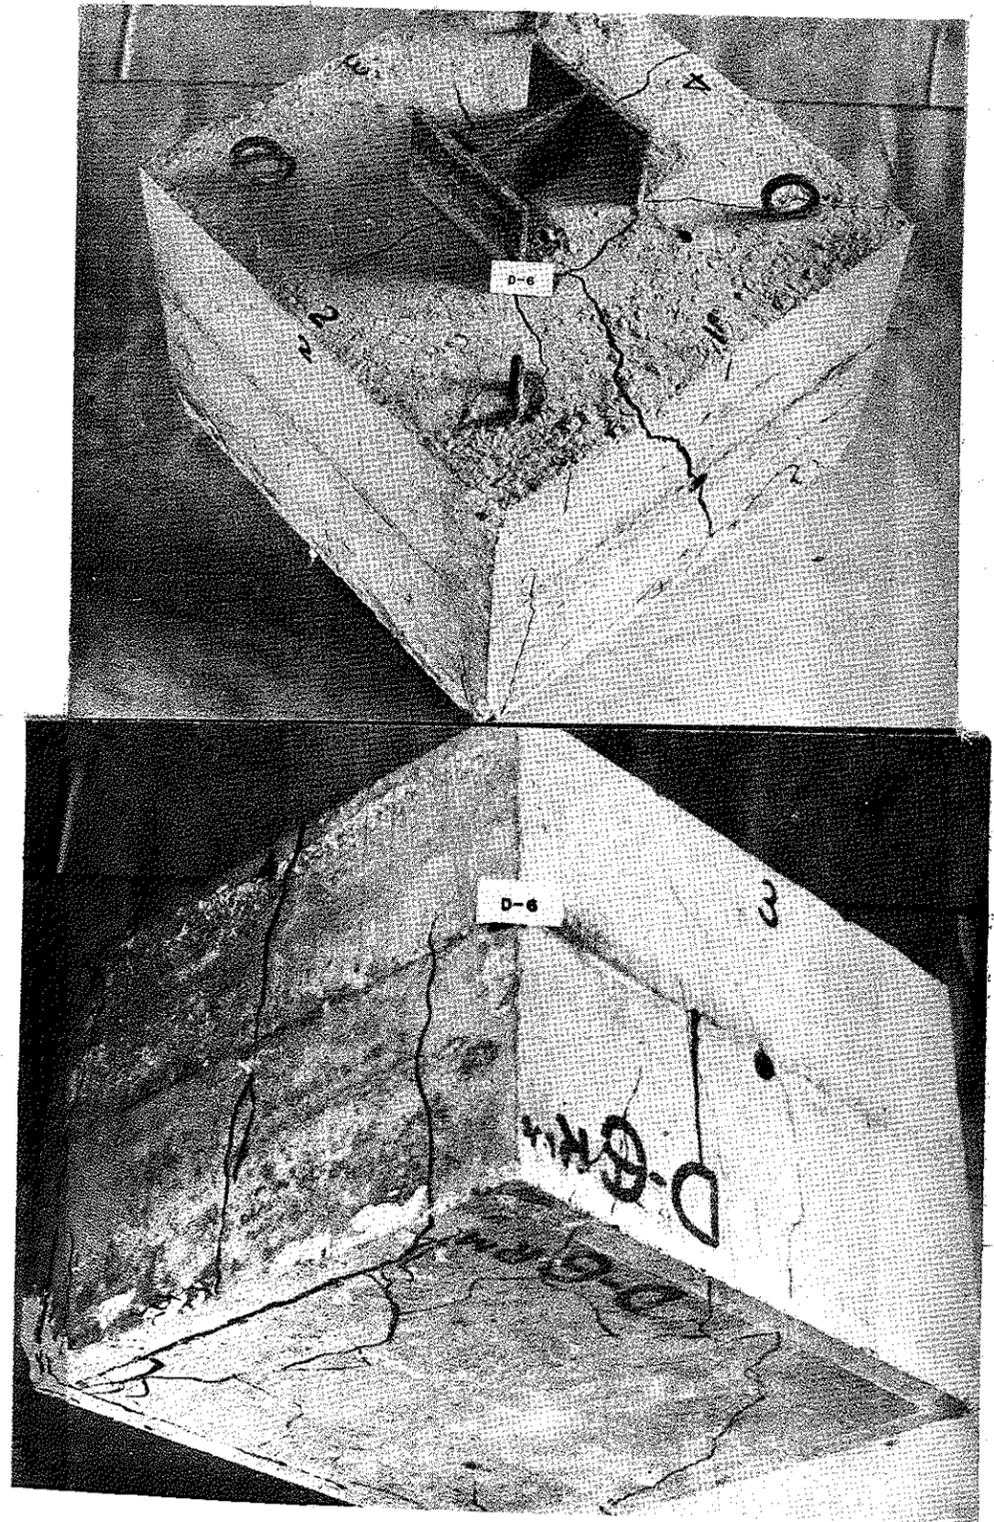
APPEARANCE OF SPECIMEN D-6 AFTER TESTING.
